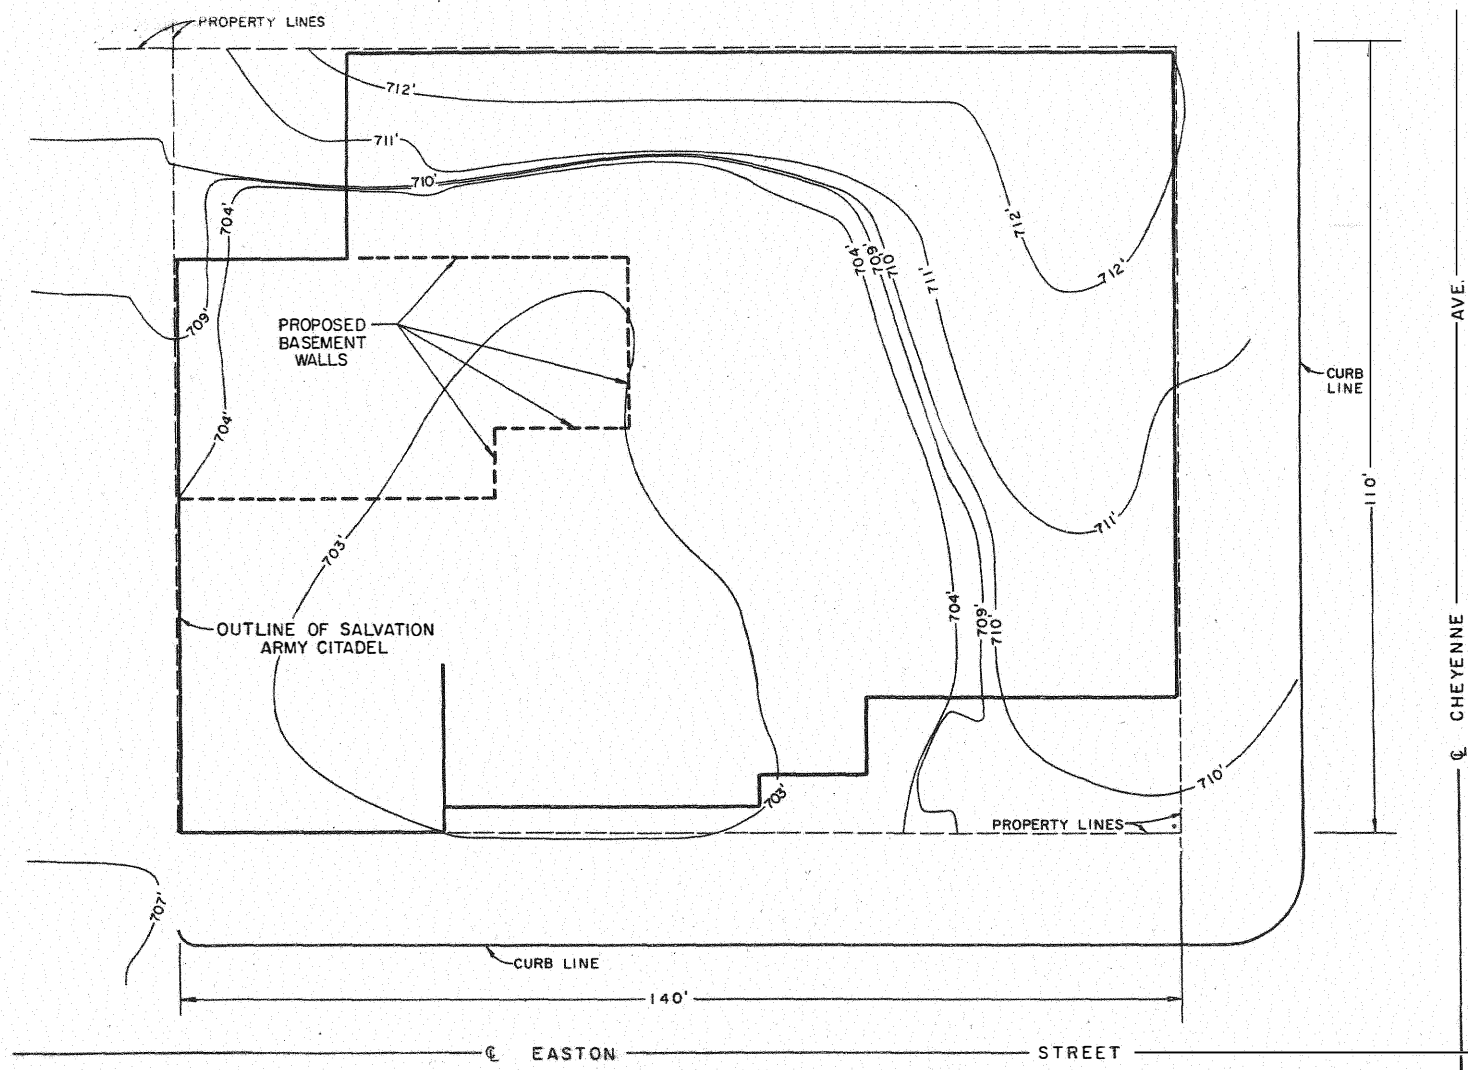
Original Ground Contours at the Salvation Army Citadel Site
